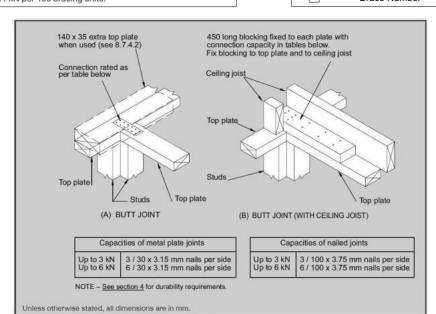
Connecting top plates to external walls at right angles - Walls containing bracing (see 8.7.3.4)
